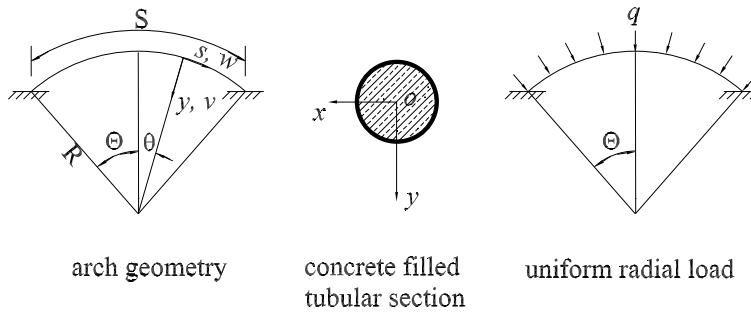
Geometry and loading for concrete-filled steel tubular arch.
